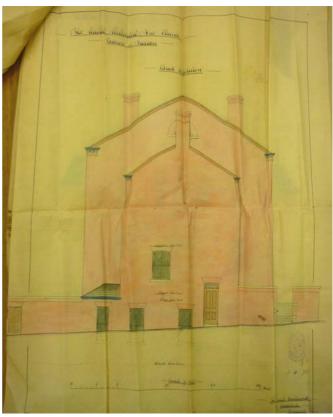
(left): Proposed front elevation (CRO(B) Building Control 988 1875)
